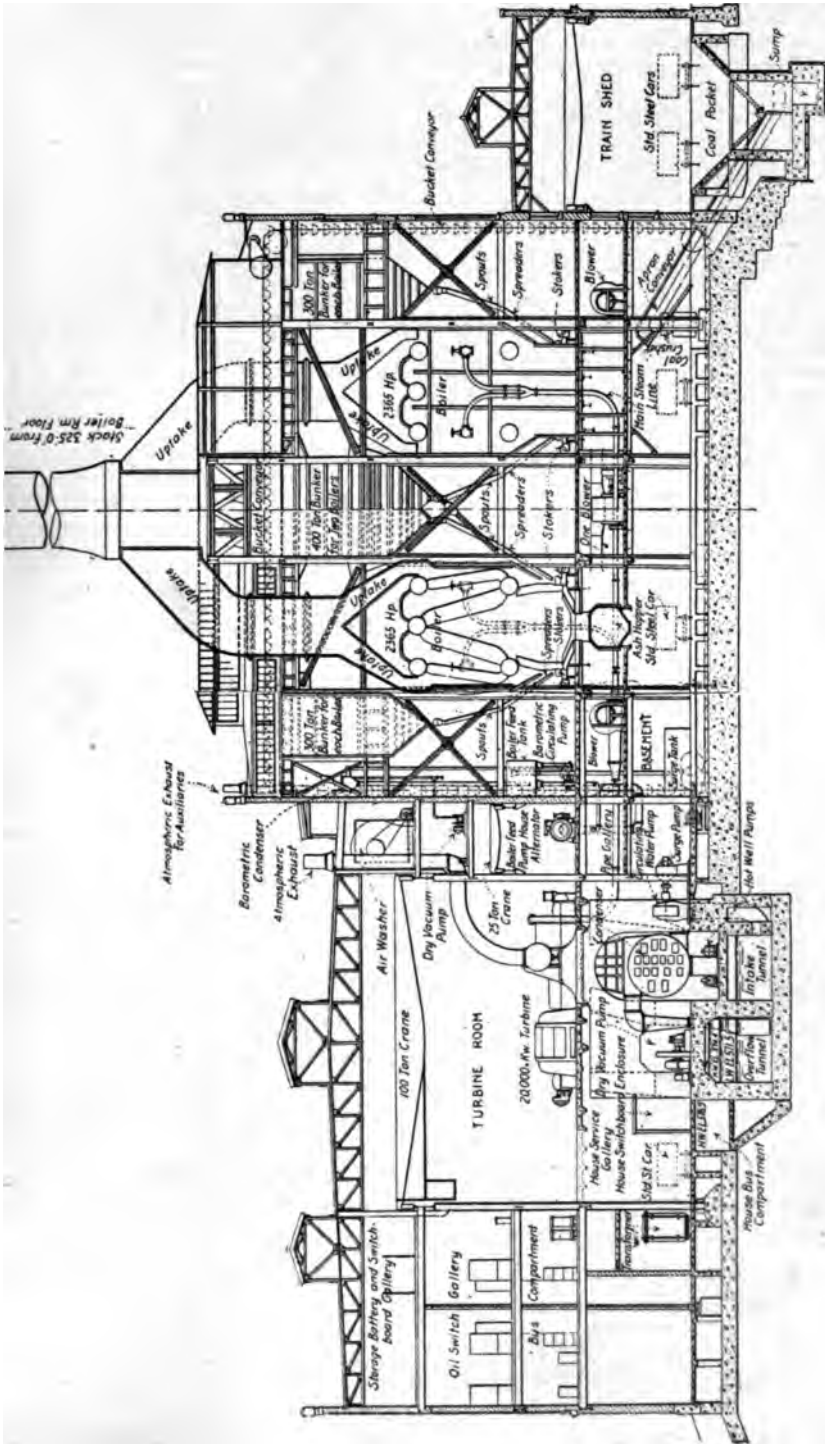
Cross-section Conners Creek Station, Detroit Edison Co.
